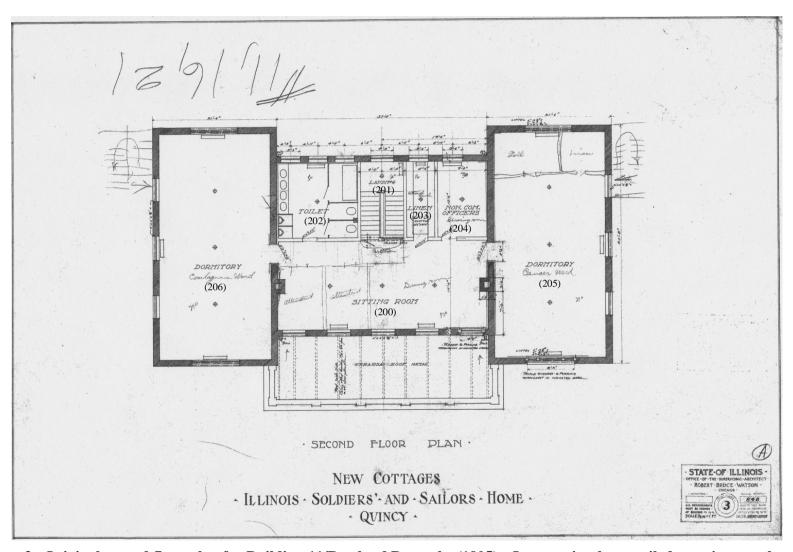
Original second floor plan for Building 11/Rowland Barracks (1905). Once again, the penciled notations on the plan refer to changes made to one Building 11's "sister" cottages (possibly Building 21/Fogg Barracks). The second floor plan of Building 11 largely remained unchanged, other than the addition of the two fire escapes and upgrades made to the bathroom.
